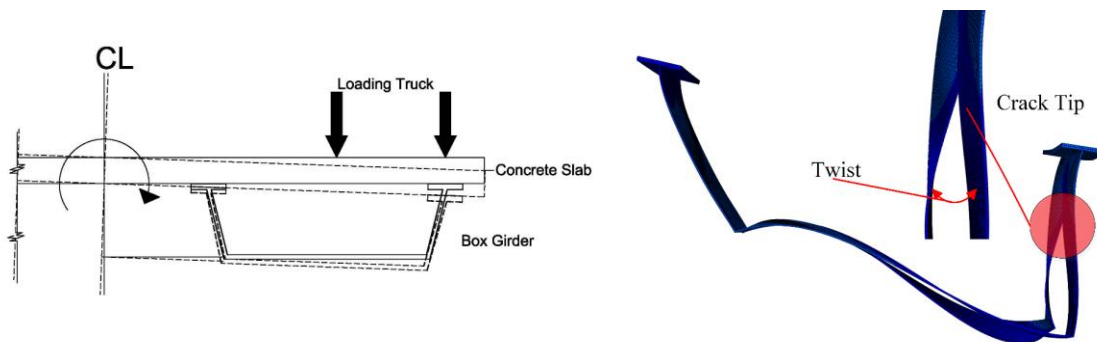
Bridge behavior under applied loads in the presence of a girder crack
